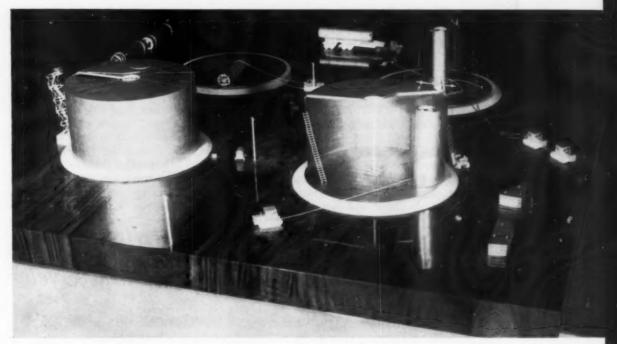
Transportation, Erection and Field Welding of Tanks. In the rear, cylinders of rolled-up plate (see Fig. 7) are being carried, stored, or readied for tank construction. Two stages of the fabrication are shown in the foreground. As can be seen, the cylinder is
